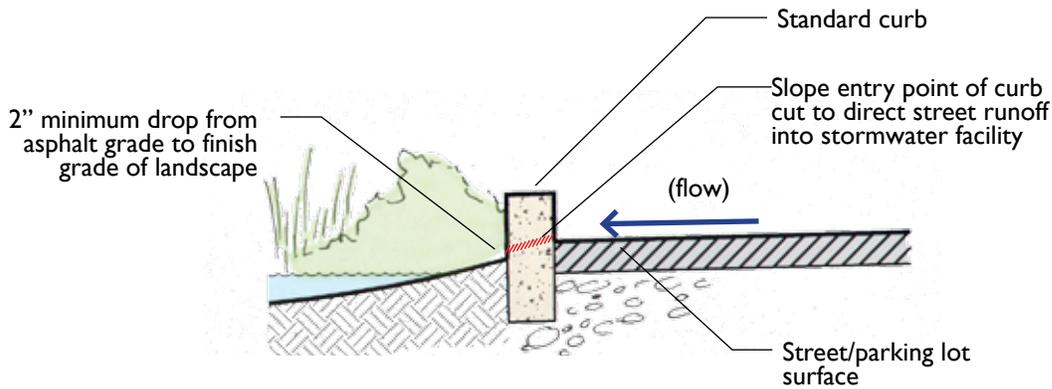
A typical curb cut used to allow water to enter a stormwater curb extension.
